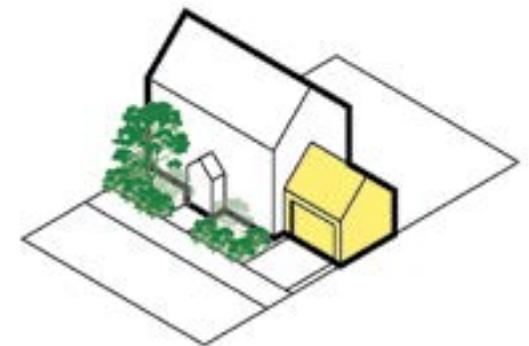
Illustrative diagram showing an indicative layout of on-plot garage parking.
